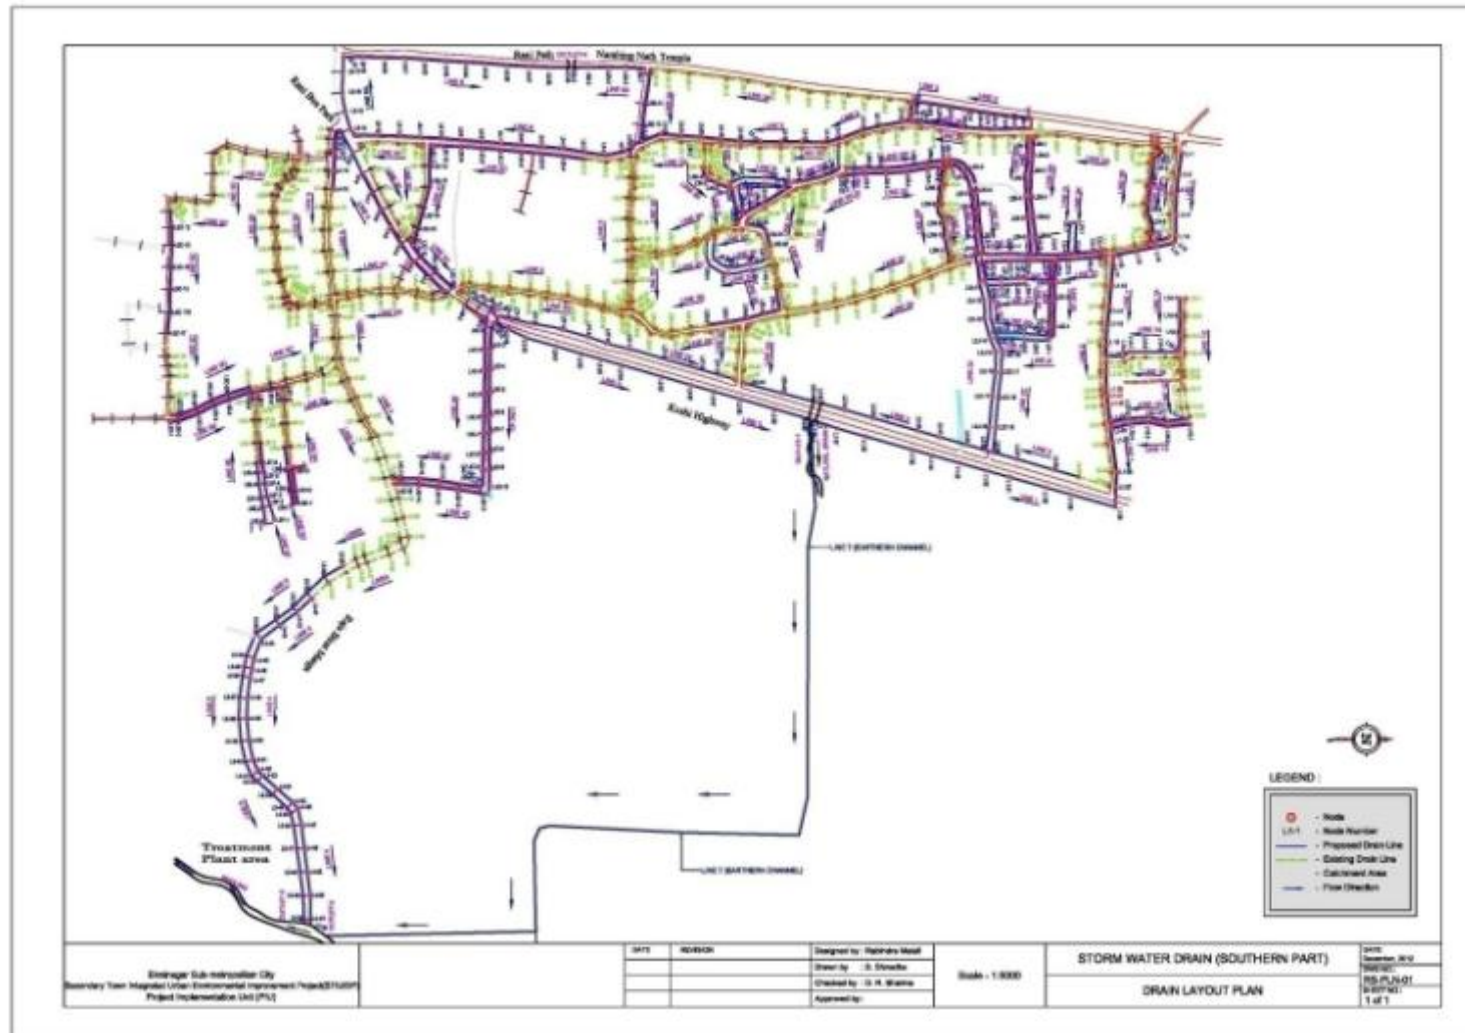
Proposed Storm Water Drains in BSMC (Southern Drainage System)
